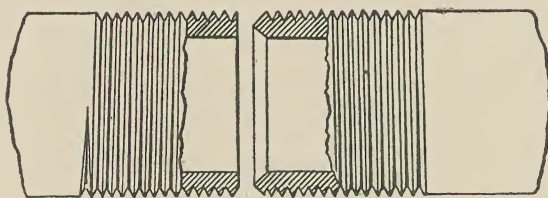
Method of Joining Pipes for High-pressure Heating.
